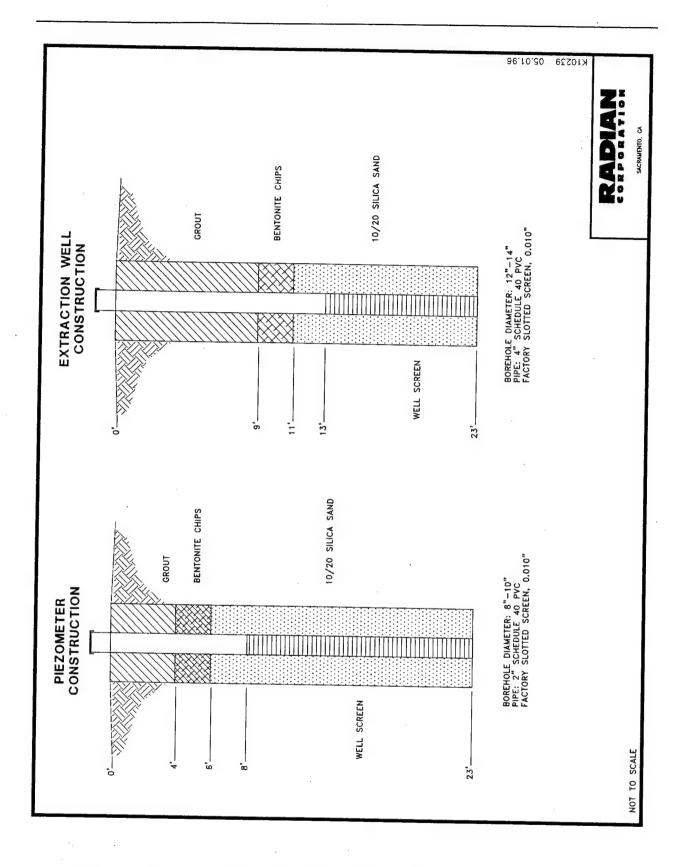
Extraction Well and Piezometer Construction Detail (BG-04)
